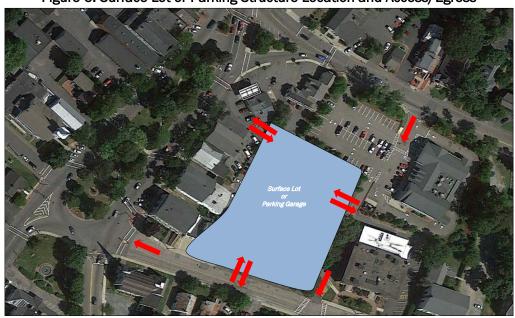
Surface Lot or Parking Structure Location and Access/Egress
